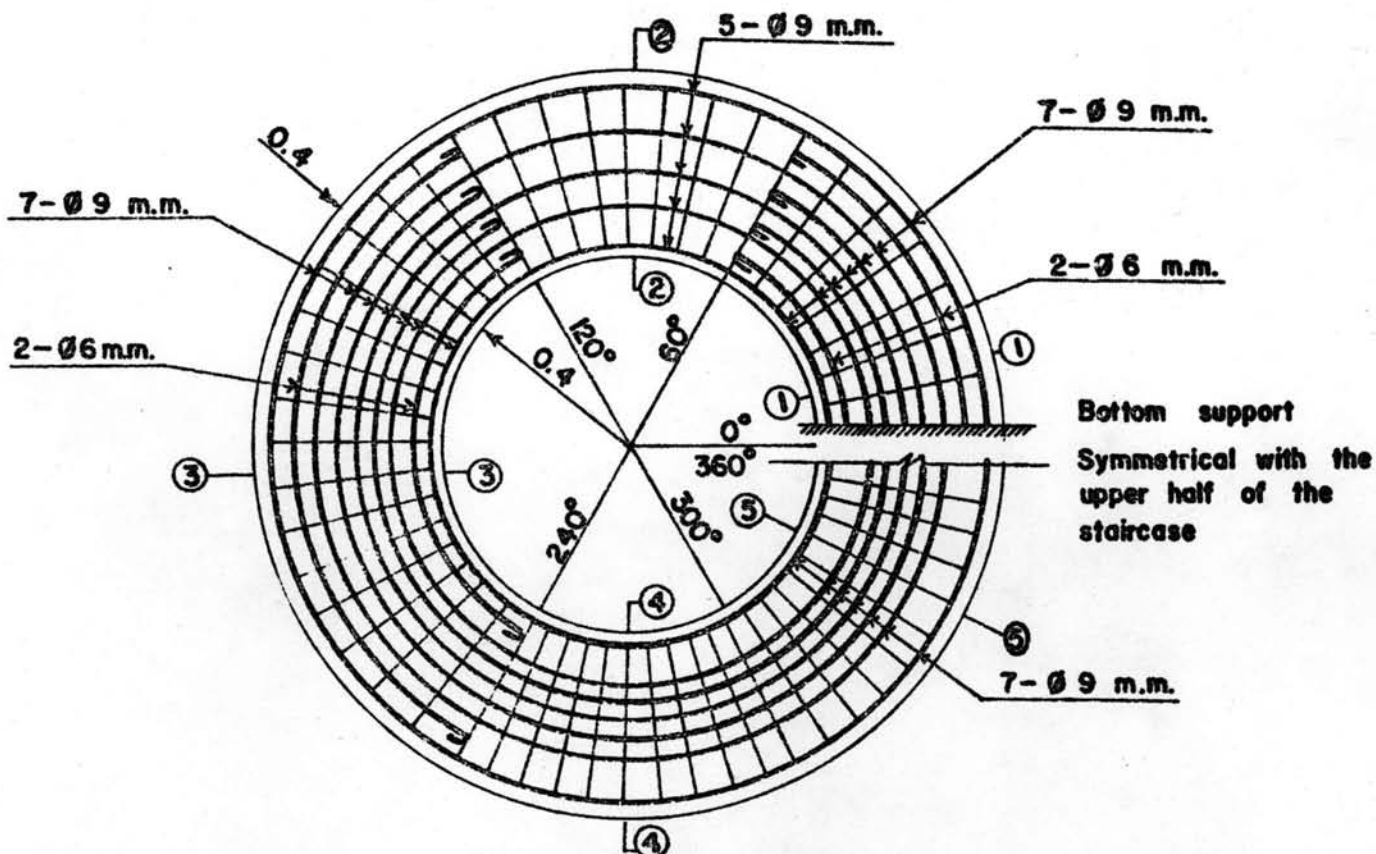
Detail of reinforcement at the top face for lower half of the stair case
